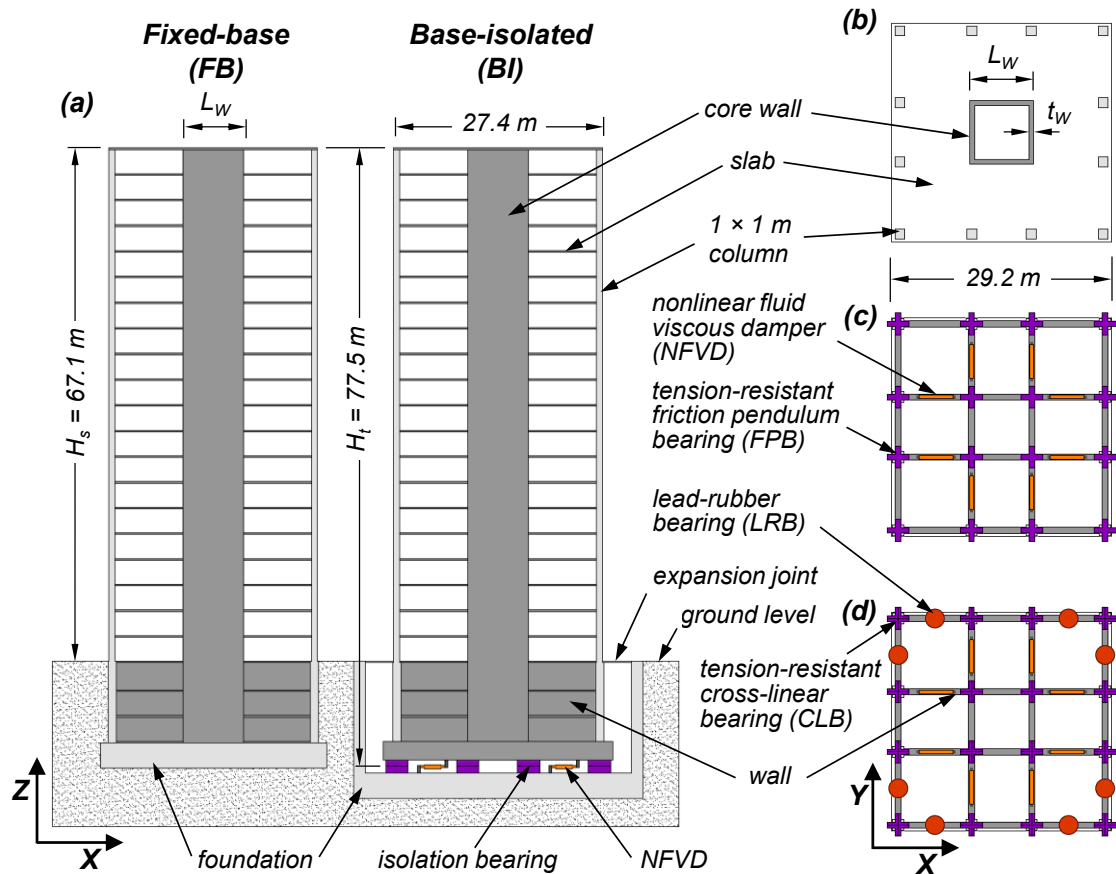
(a) Elevation of the 20-story buildings; (b) Floor plan-view above ground; (c) Plan-view of isolation system 1; and (d) Plan-view of isolation system 2.
